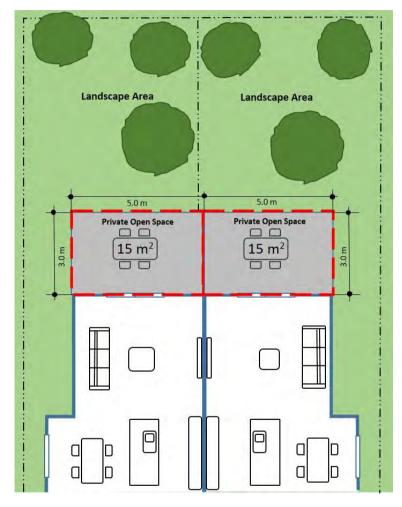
PRIVATE OPEN SPACE EXAMPLE
